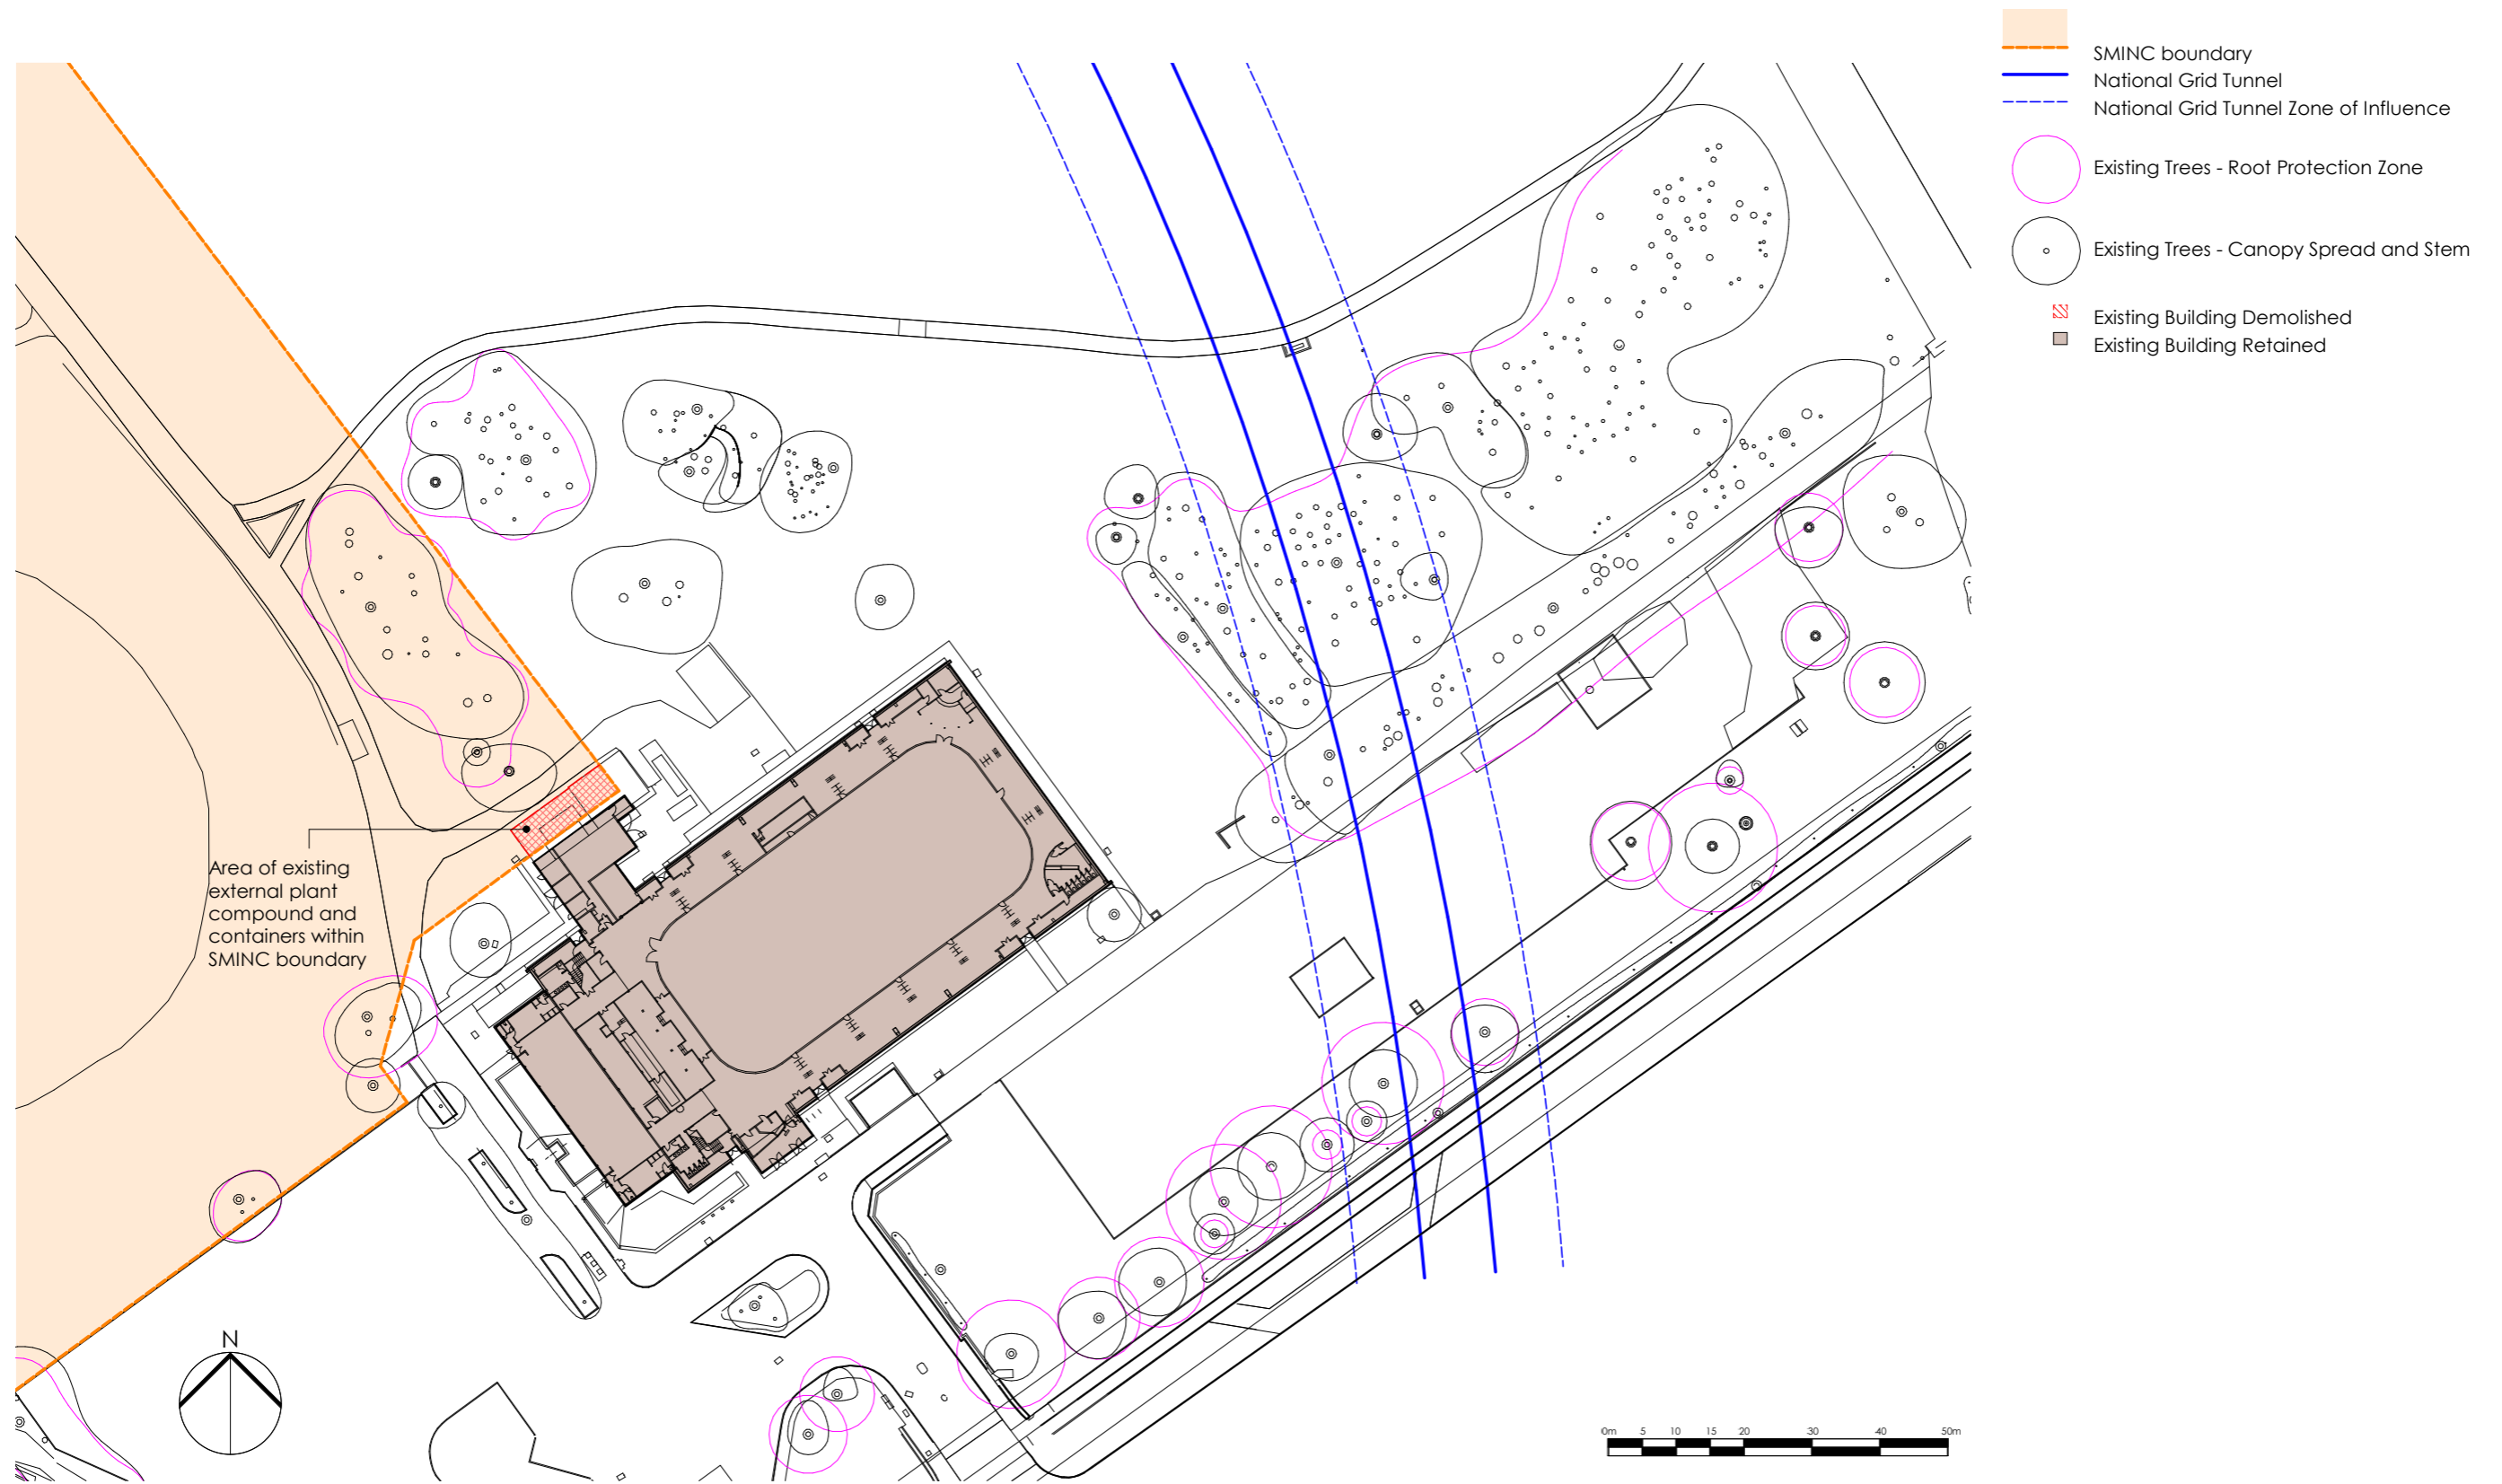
Phasing Strategy and Construction Logistics Plan - Existing Building
